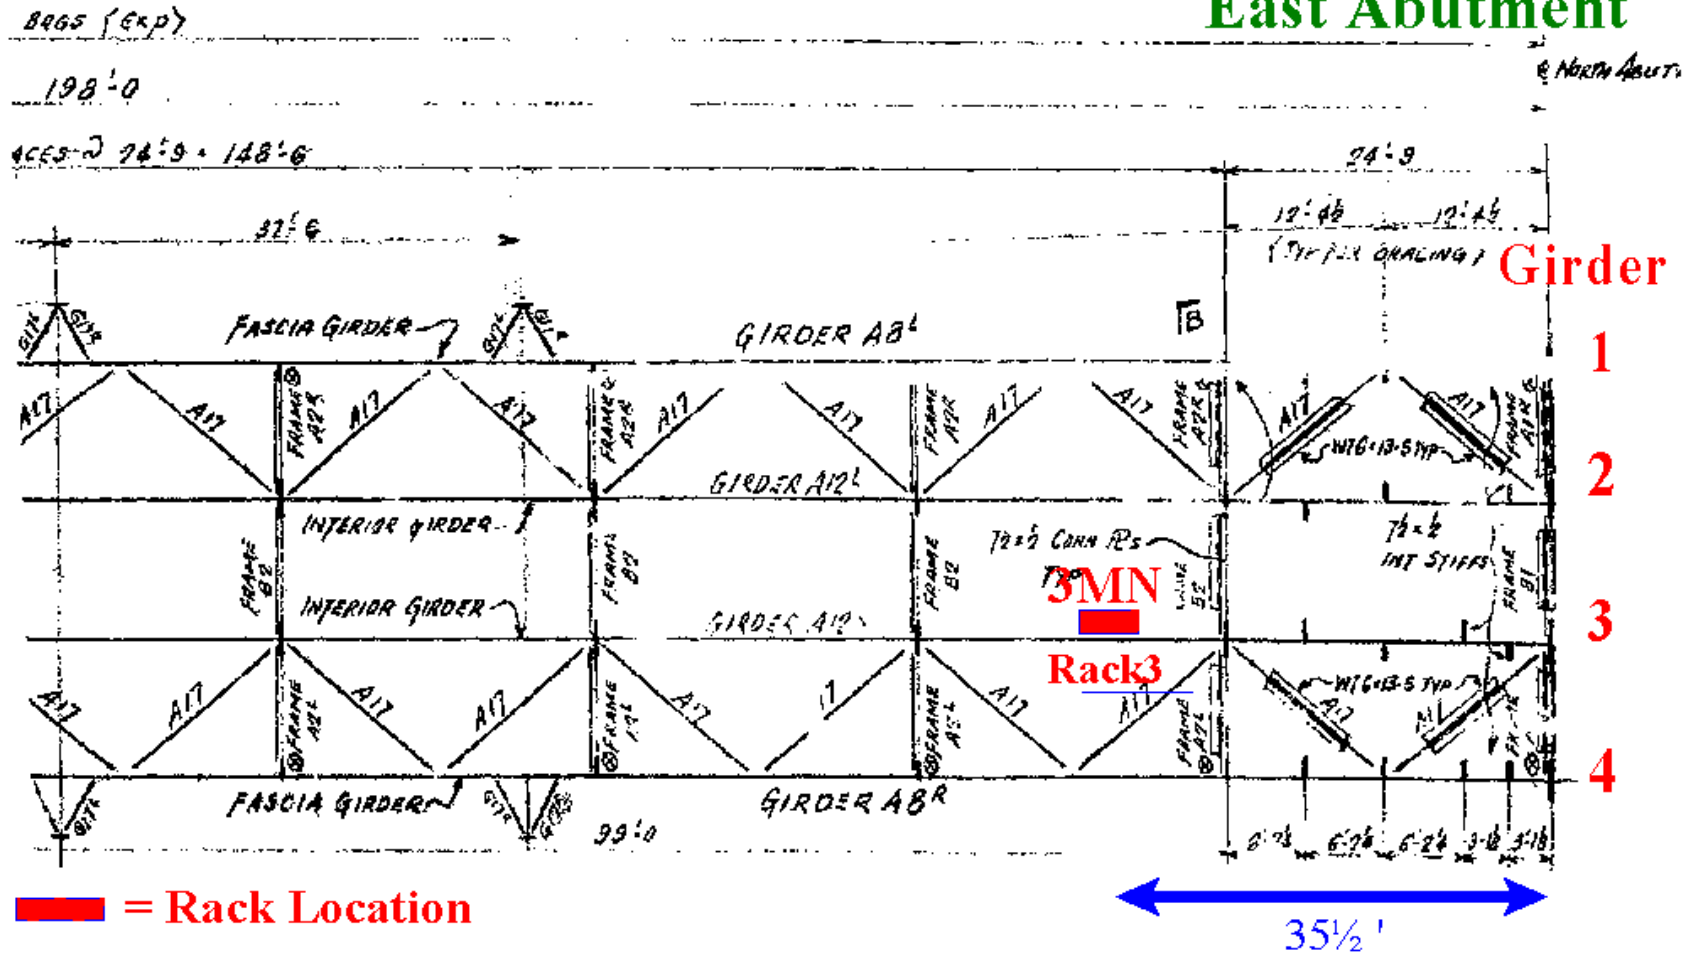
Moore Drive Bridge, east abutment Specimen Rack locations on girder 3, north side.
